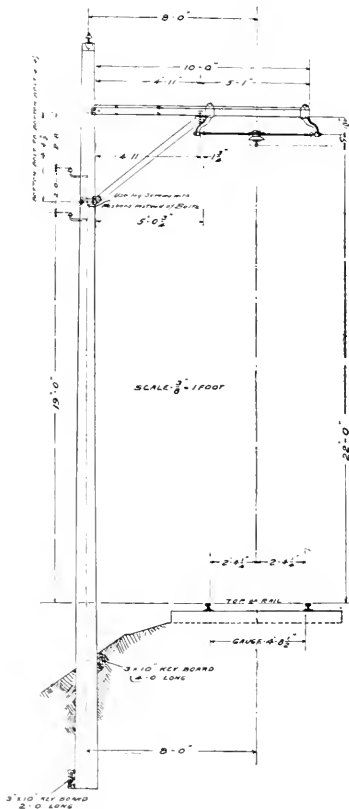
TYPICAL STRAIGHT LINE OVERHEAD CONSTRUCTION.
